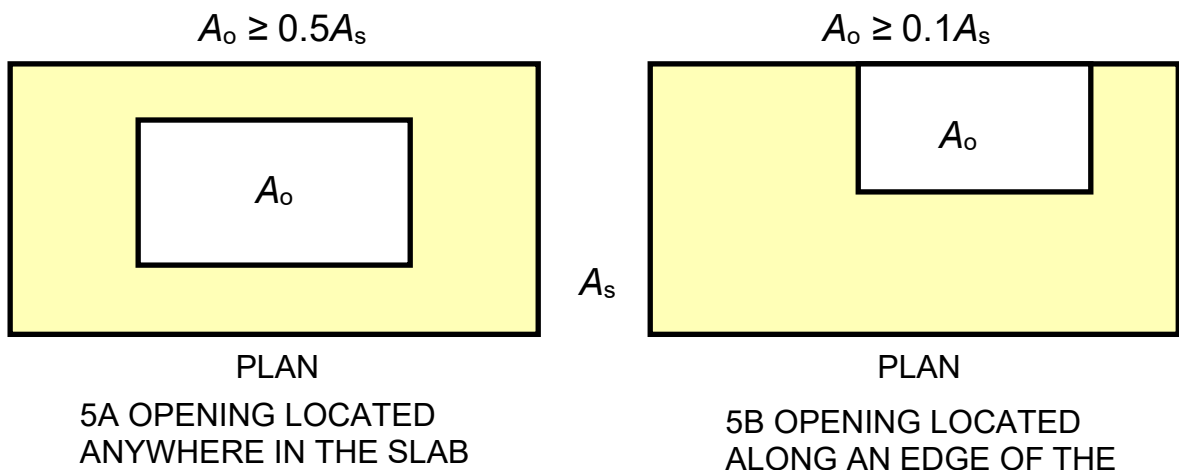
FLOOR SLABS IN BUILDINGS HAVING EXCESSIVE CUT-OUT AND OPENINGS
